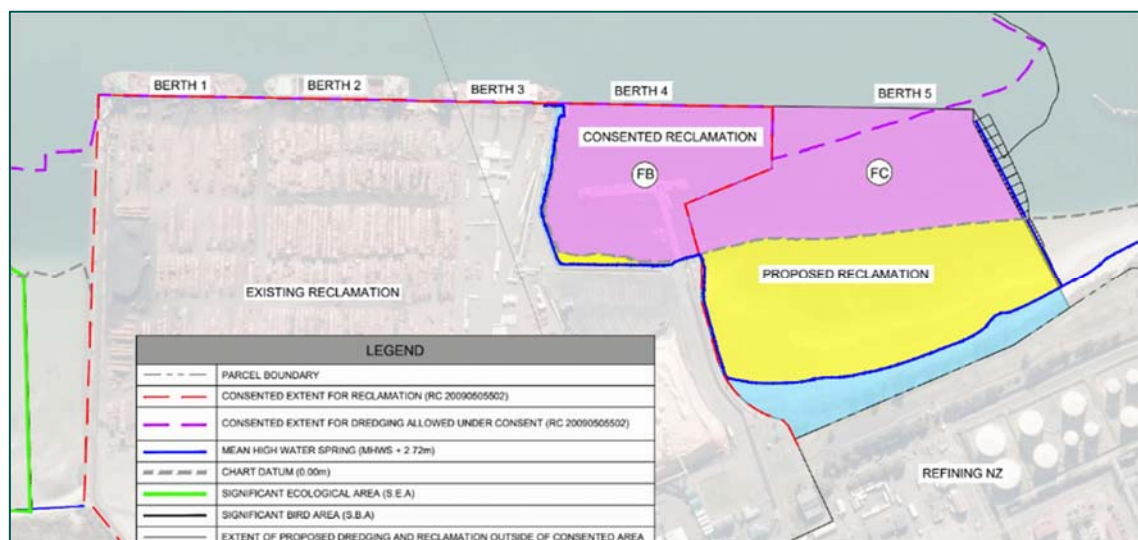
Plan showing existing Northport facilities (Berths 1 – 3), the consented but not yet constructed Berth 4, and the proposed Berth 5 (source: Appendix 3: Design Drawings).
